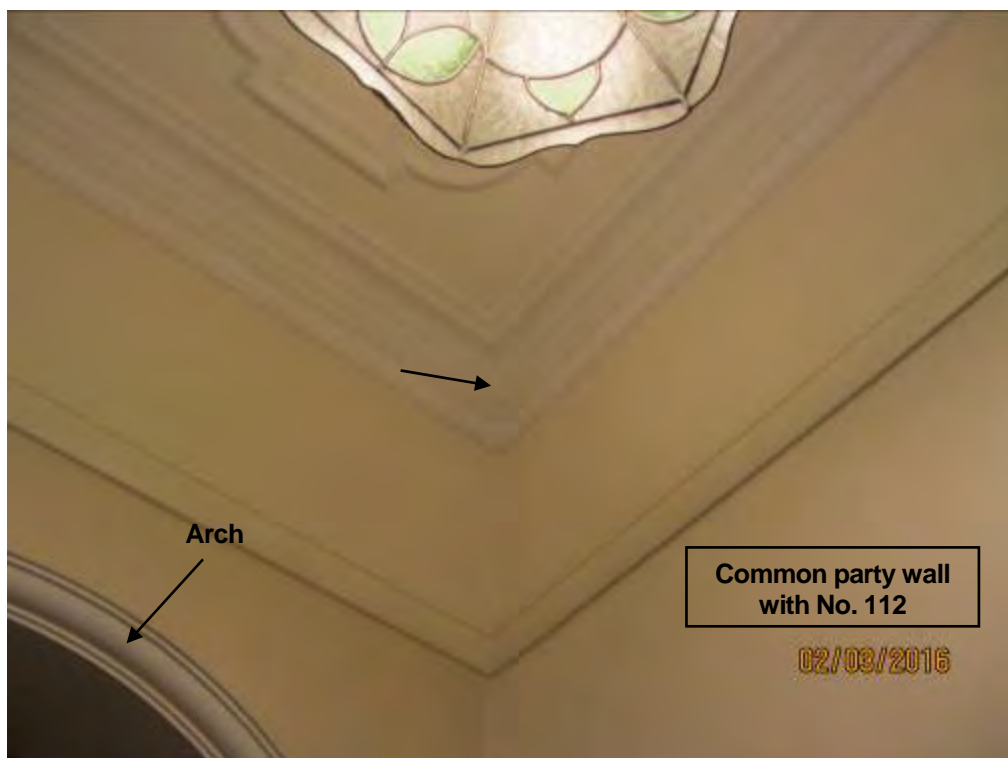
shows the Hallway viewed towards the rear [Living room]
